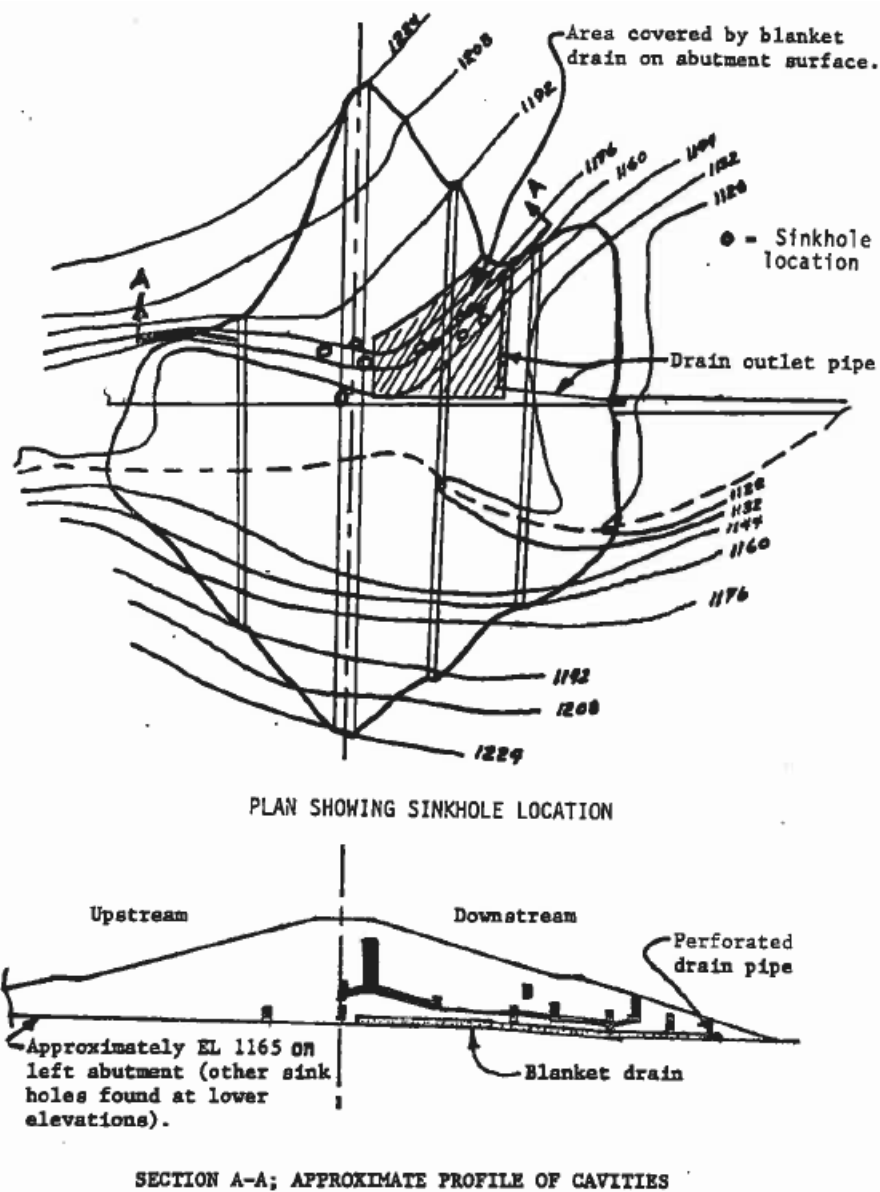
Plan and section views of sinkhole occurrence in Brodhead Dam (Talbot 1986).
